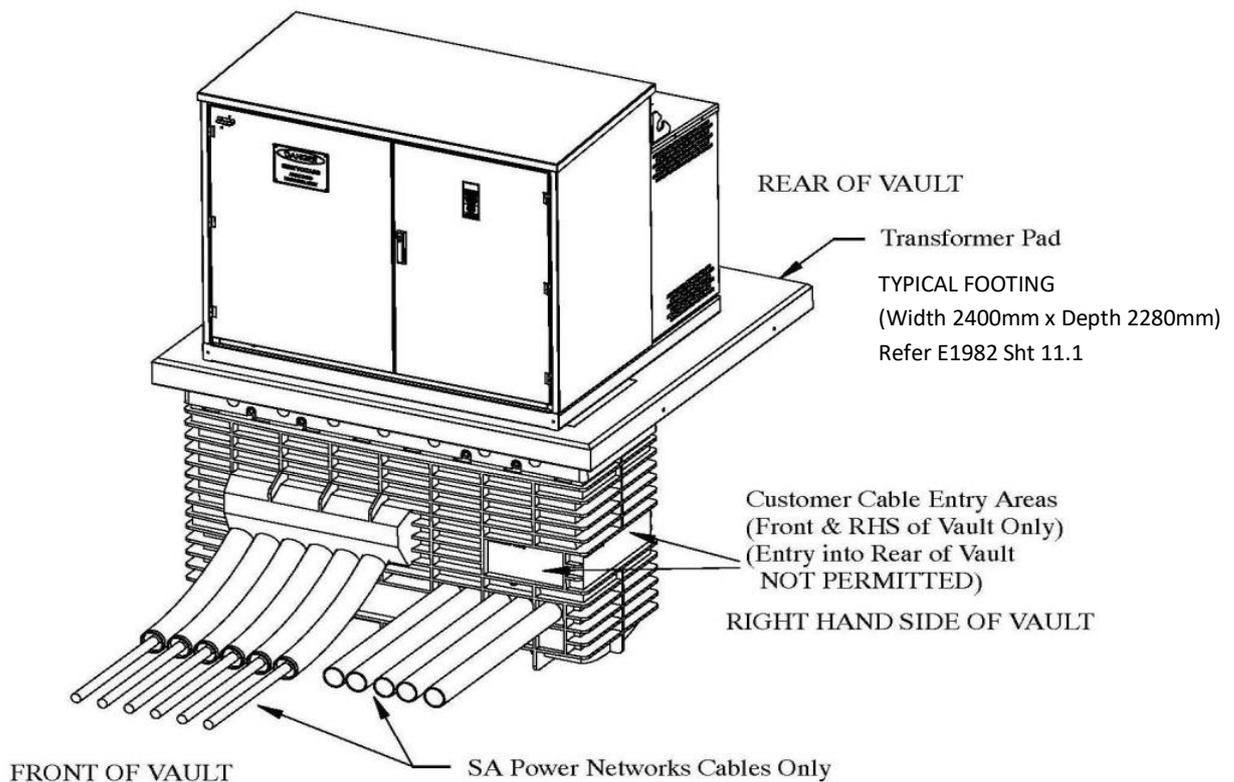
Typical Footing Arrangement for the Mk7 Padmount Transformer
